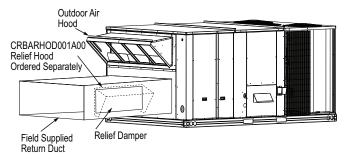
Reinstall Hinges and Damper on Return Vertical and Horizontal Applications
